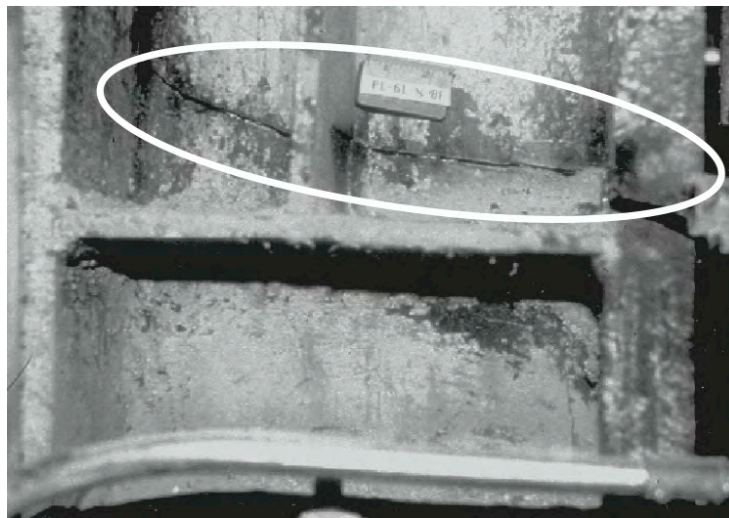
Damage to beam-to-column connection – crack in a web of I cross section
